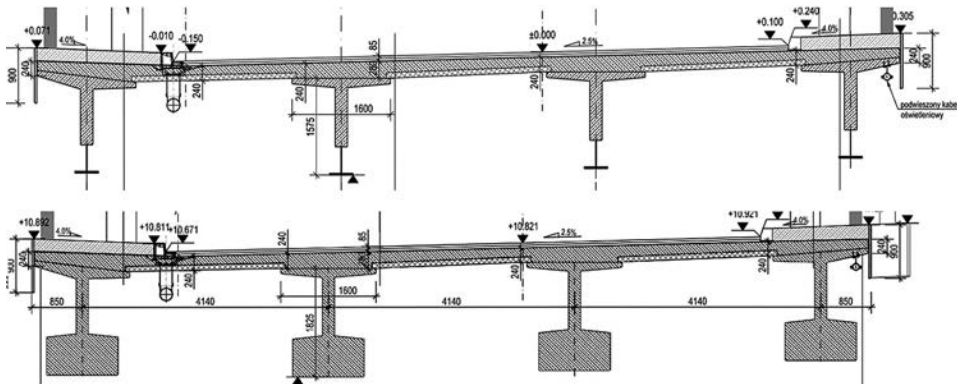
Typical mid-span and internal support cross-sections of one of multi-span continuous hybrid bridge of S3 express way [5]
